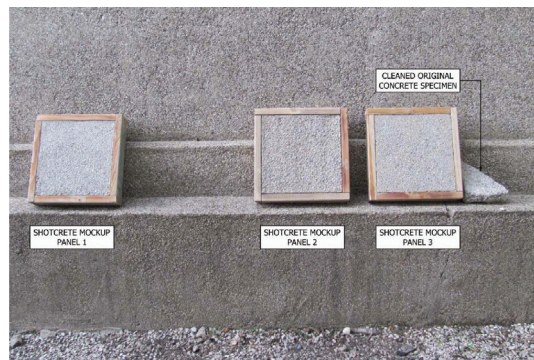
Field mockup shotcrete panels compared to cleaned original concrete specimen
